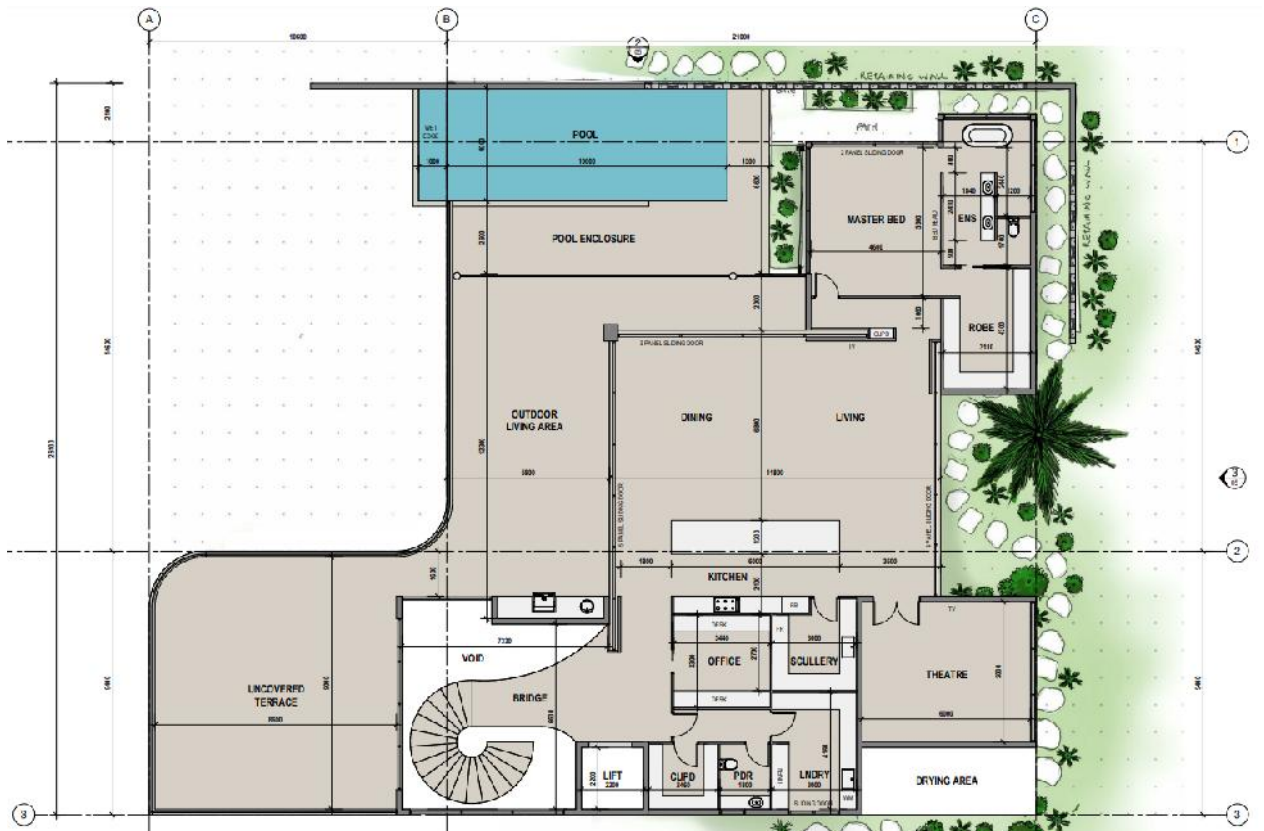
Site Plan (Source: Bâlay Vandyke, 2023)
